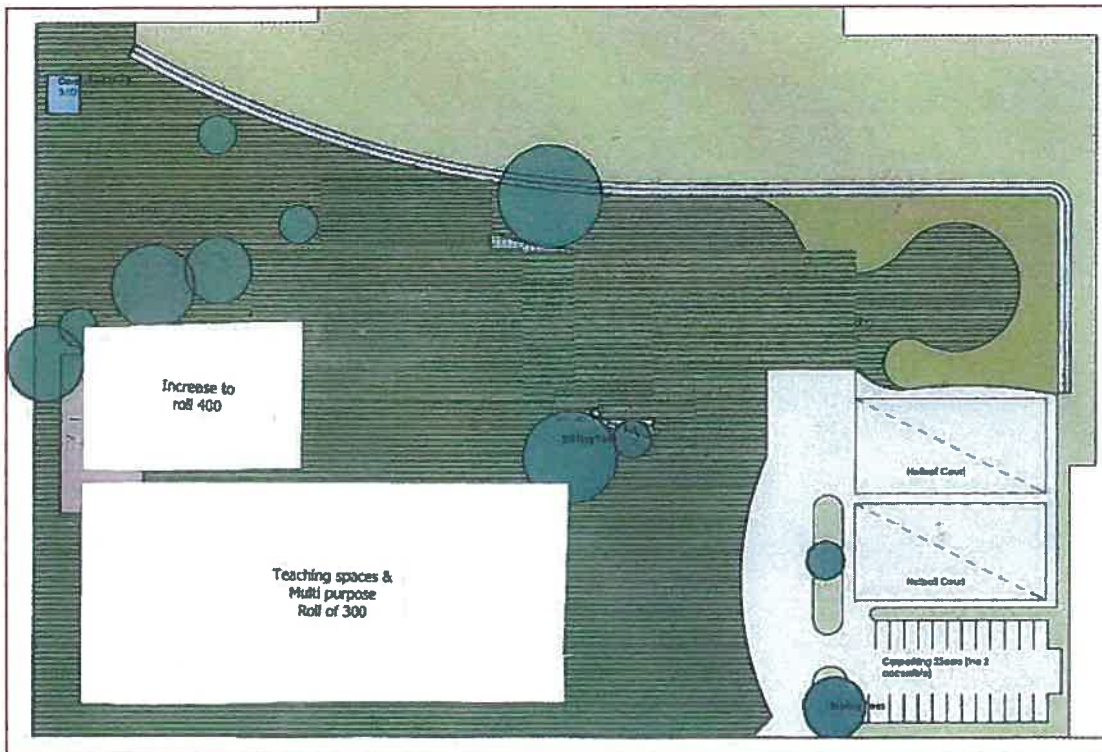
Draft bulk and location plan to show alternative building locations for a rebuild
